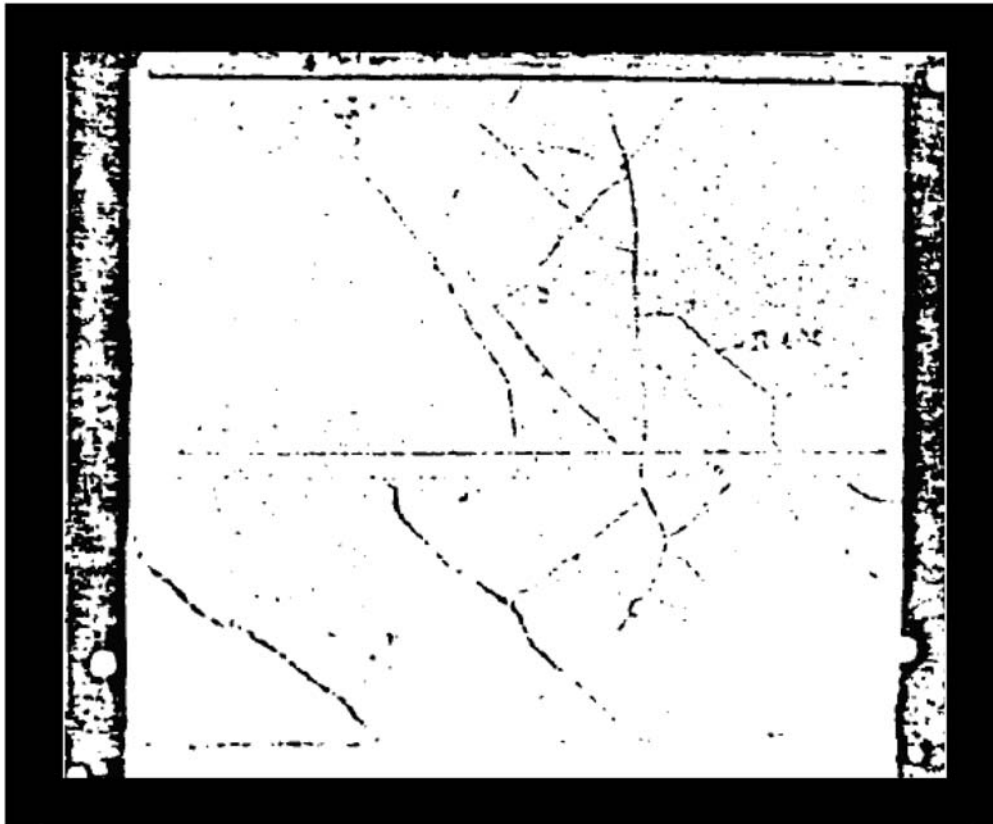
In situ testing specimen of wall with lath and plaster finish, after testing (Schmid 1984).
